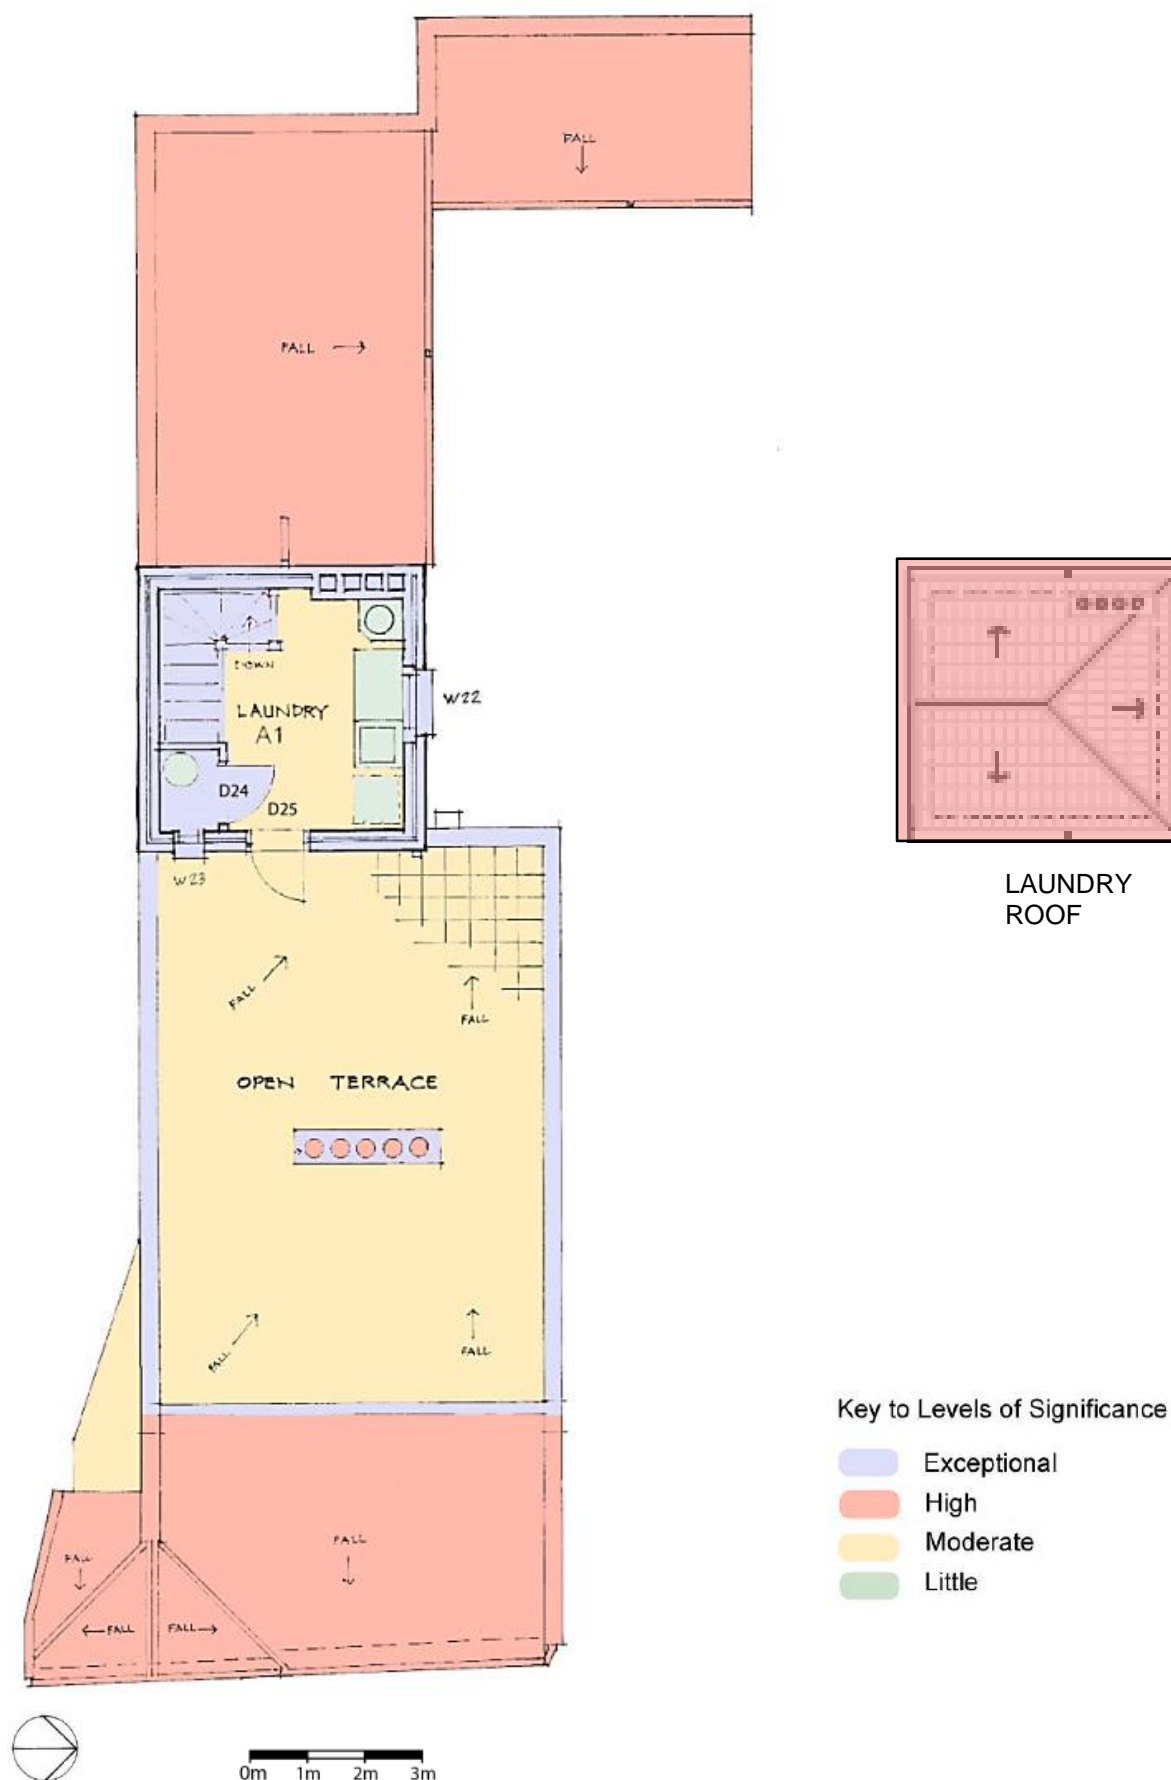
117-117A Gloucester Street – Third floor and roof grading of significance.
